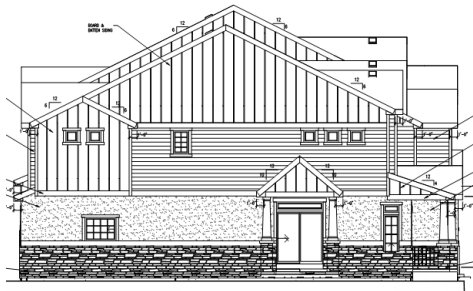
Example of a covered porch on the side elevation of a townhome building.
